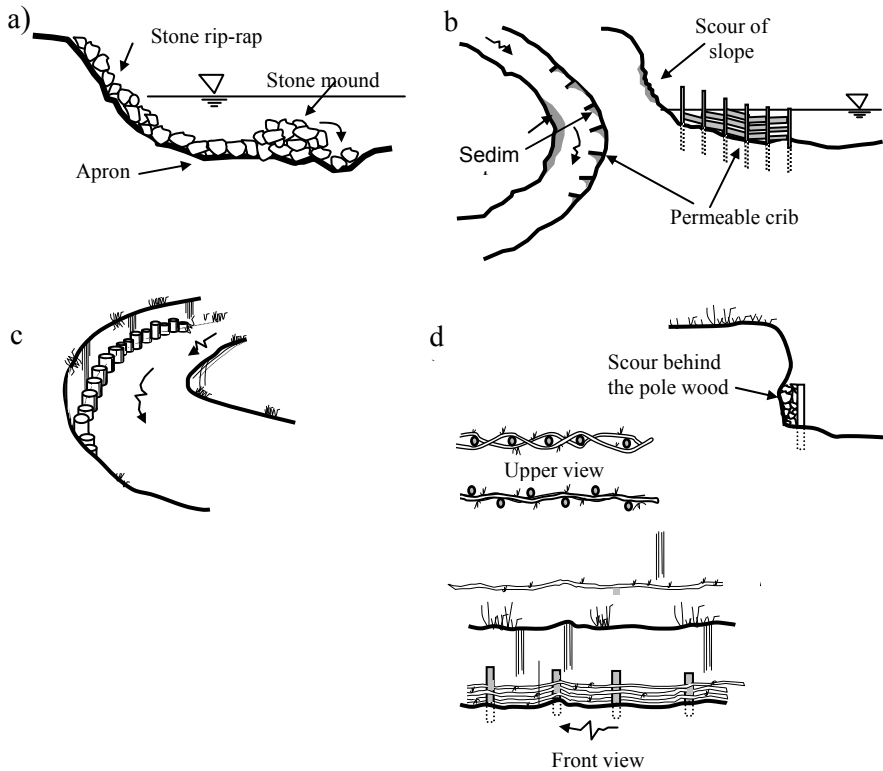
River slope countermeasure: (a) stone rip-rap, (b) wood crib, (c) pile wood, (d) wattle (Gordon, N.D., 1994)
